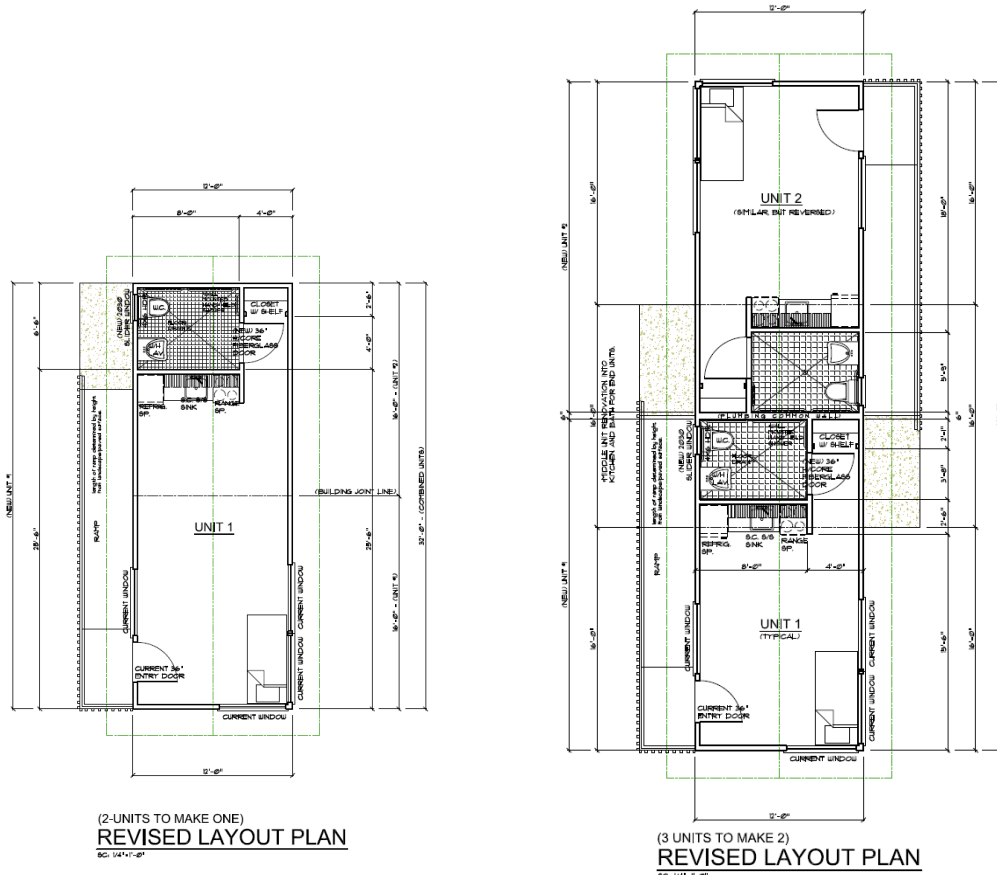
Single Unit Floor Plan²⁰⁸ Figure 137: Double Unit Floor Plan²⁰⁹
